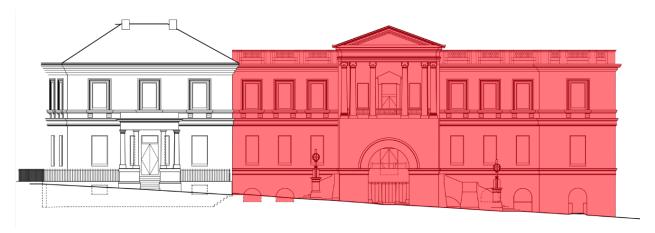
Diagram indicating building stage relevant to this section of the Historical Overview shaded red *Source: Urbis
